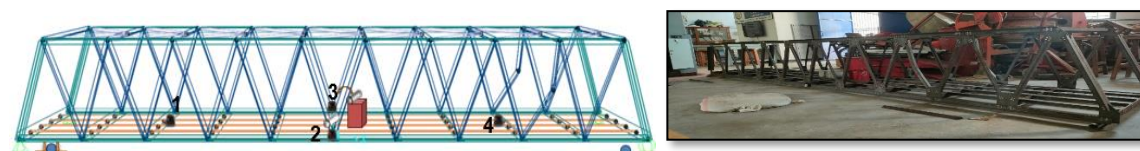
Damage Specimen with Damage at one-quarter span of the bridge.
